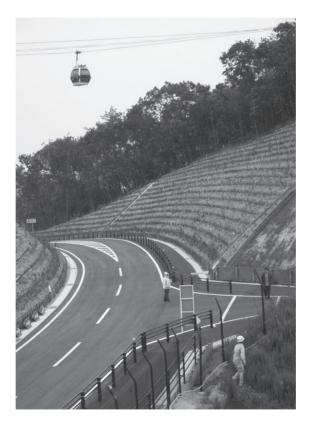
Structure built to prevent soil erosion on the slope and which is supported by vegetation
